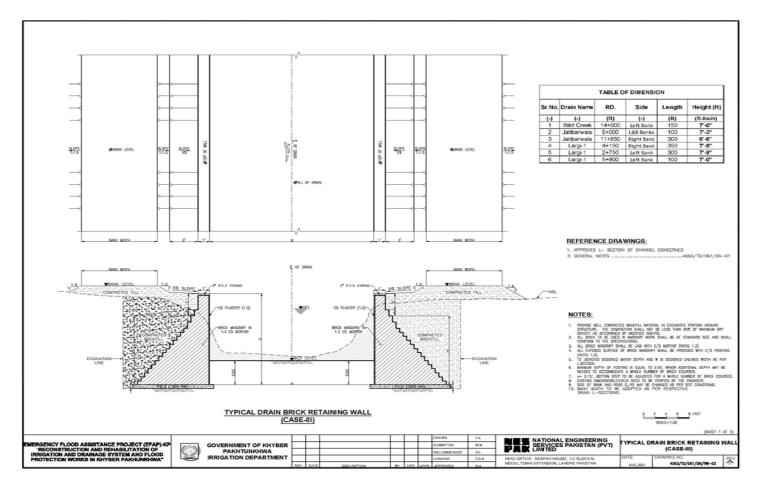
Typical Cross Section for Drain Bank Retaining Wall
